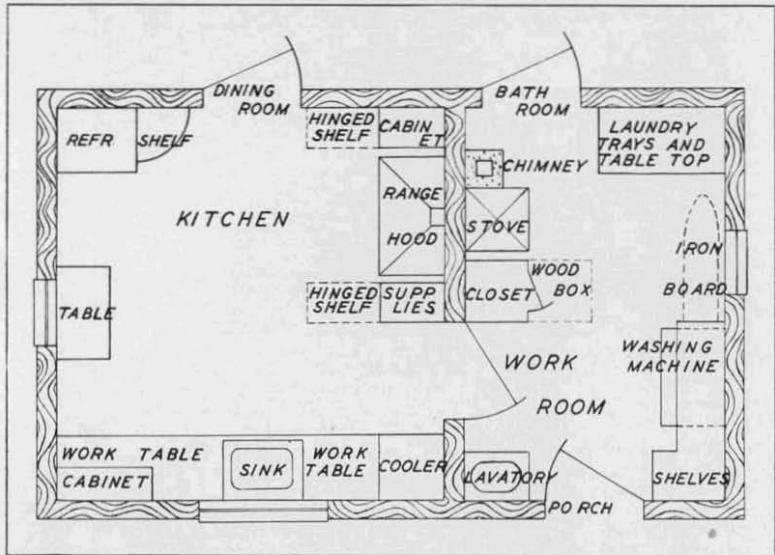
Suggested kitchen arrangement of cupboard and work tables.
